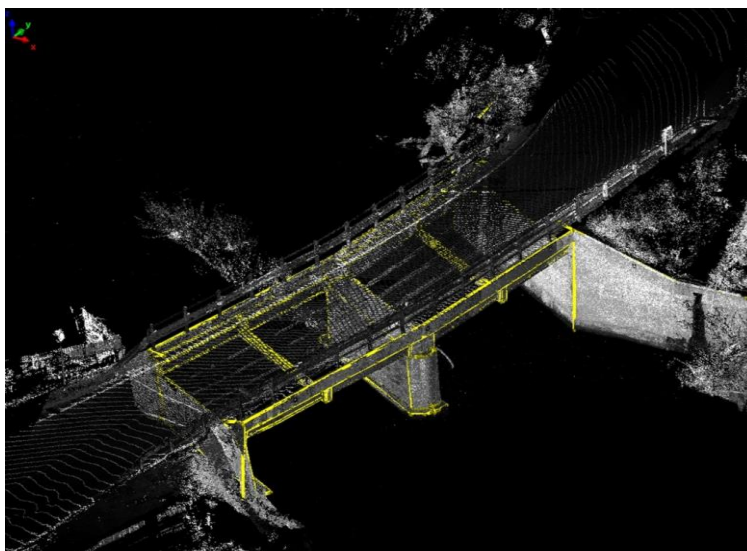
Sample of a road bridge surveying (Courtesy GEOVAP Pardubice Ltd.)
